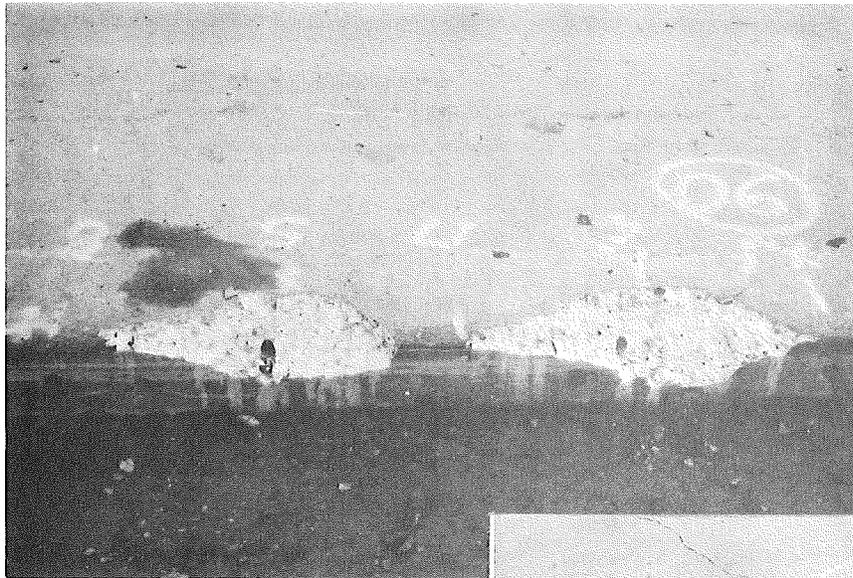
Type of concrete spalling obtained during testing of the Frazer and Jones torque-type anchors at mid-slab. Note that extensive spalling on right was increased by the transverse crack in the pavement.
